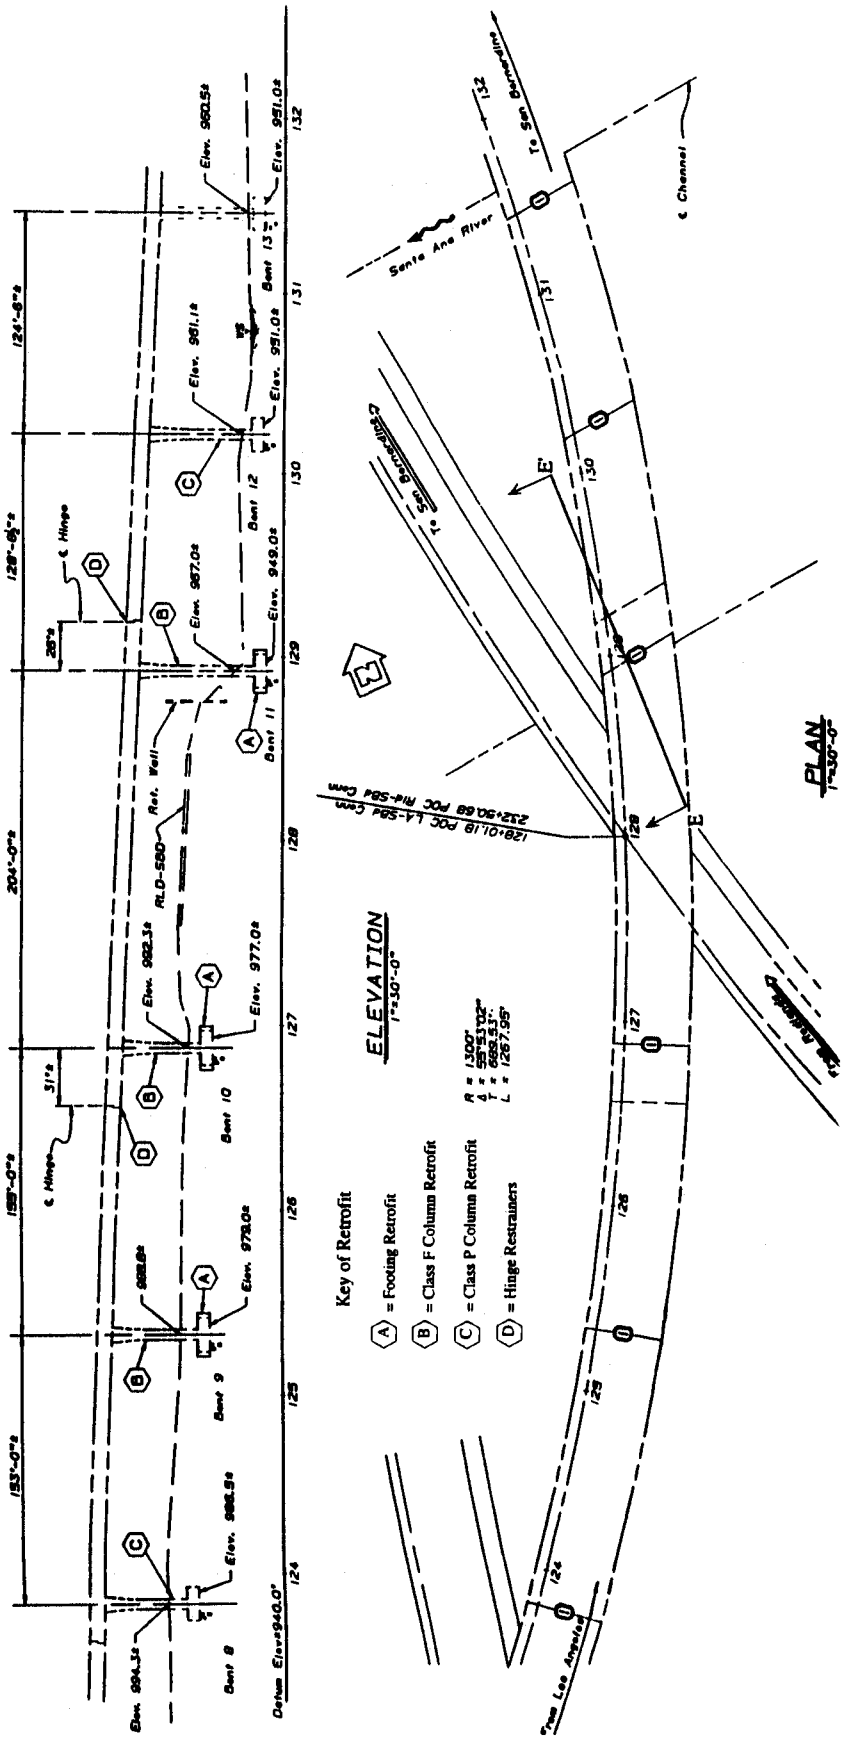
General Plan for Seismic Retrofit of Northwest Connector (from Caltrans drawings).
